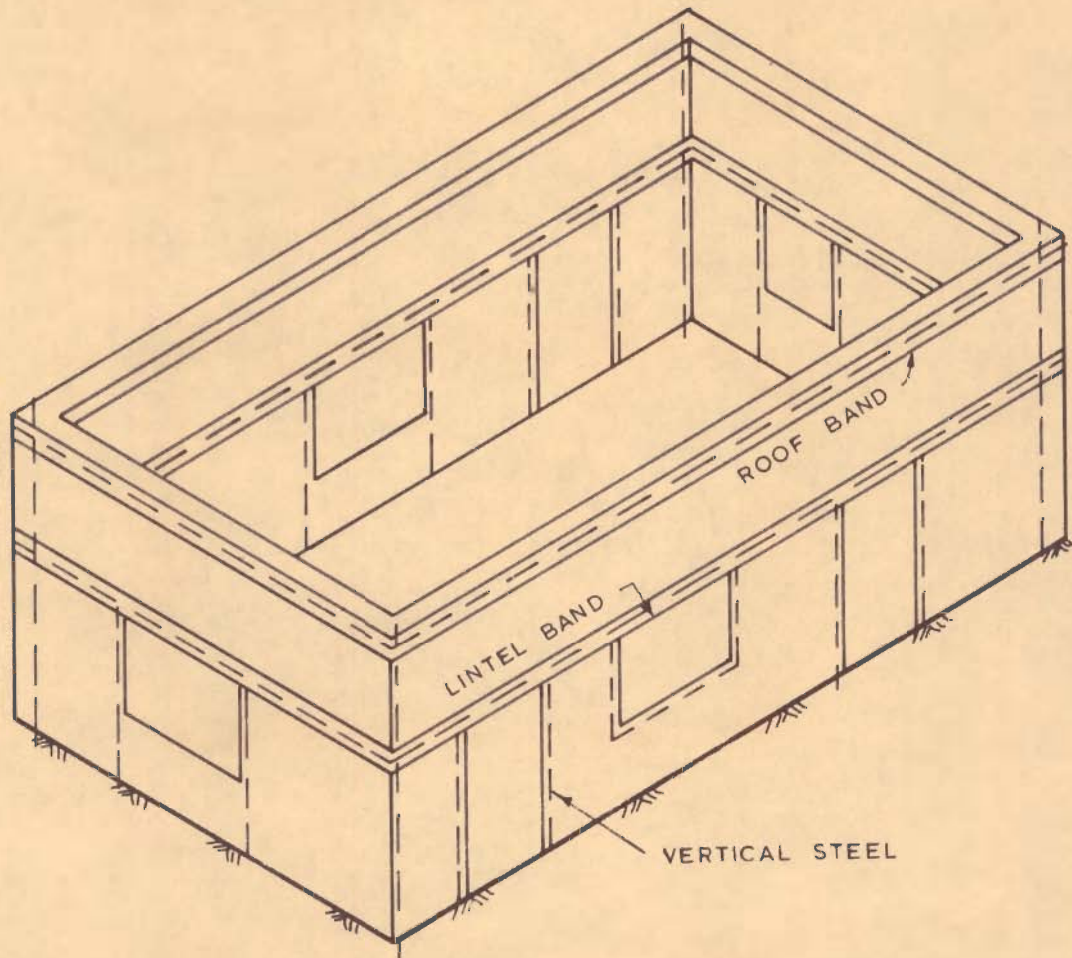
\_ OVERALL ARRANGEMENT OF STRENGTHENING
